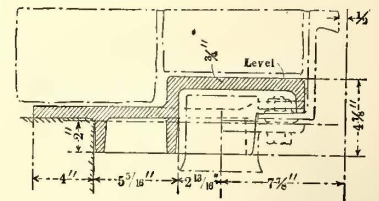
VERTICAL SECTION OF INSULATOR BOX, SHOWING PAVING BLOCK COVER.
